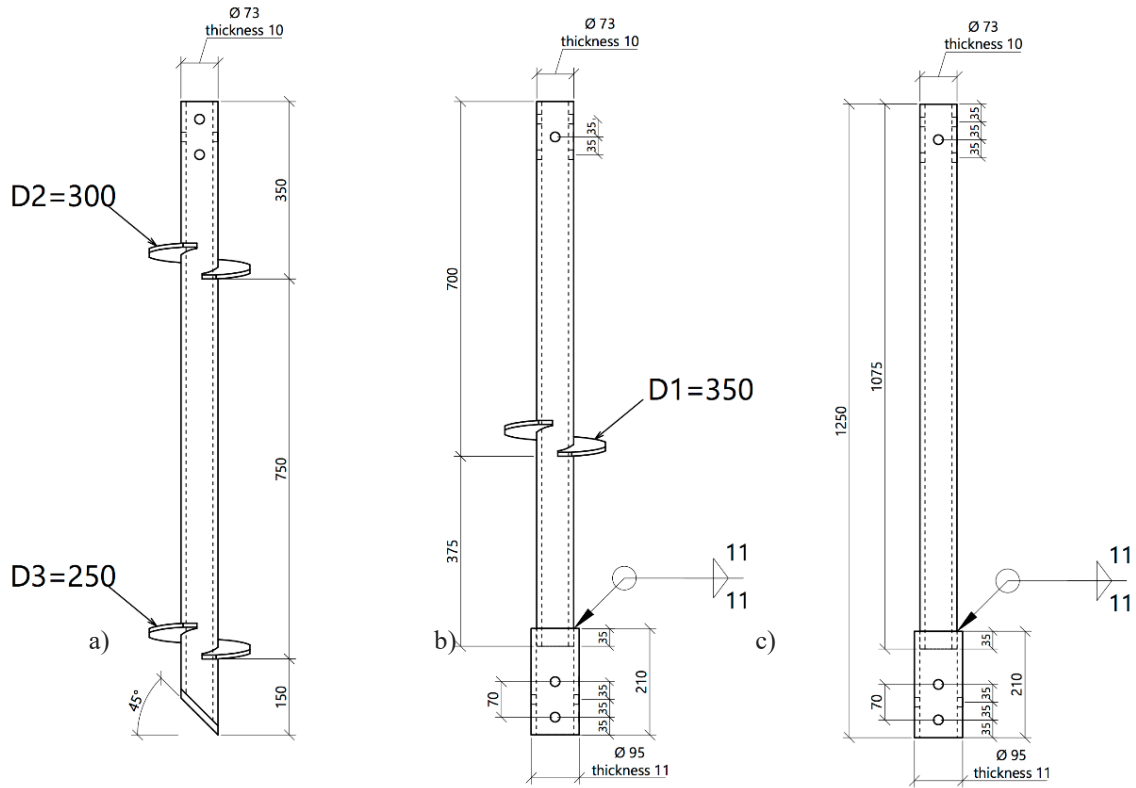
Pile sections: a) leading section; b) extension section with helical plate; c) plain extension section. Dimensions in mm; not to scale.
